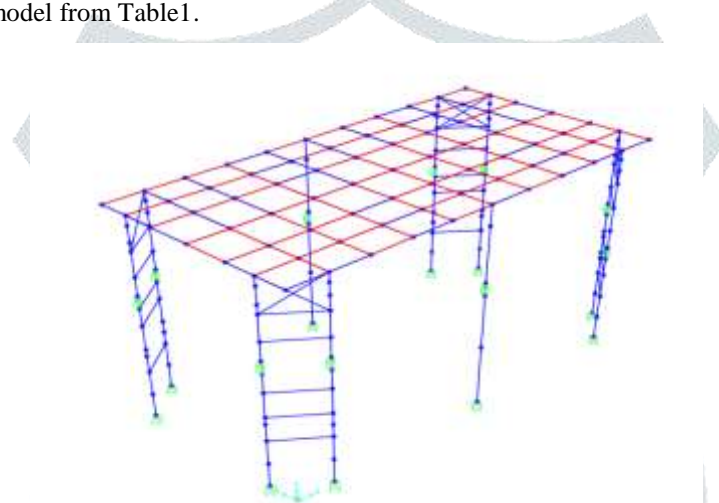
Model 1 Equivalent frame model of single-storey unreinforced masonry structures in SAP2000
